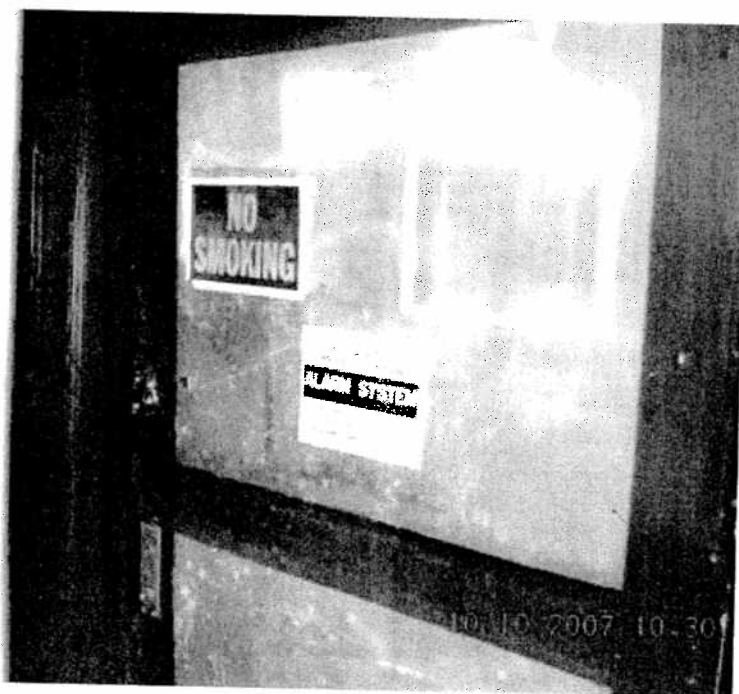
Fire door entrance to the "Commo" room west of the main hallway.
